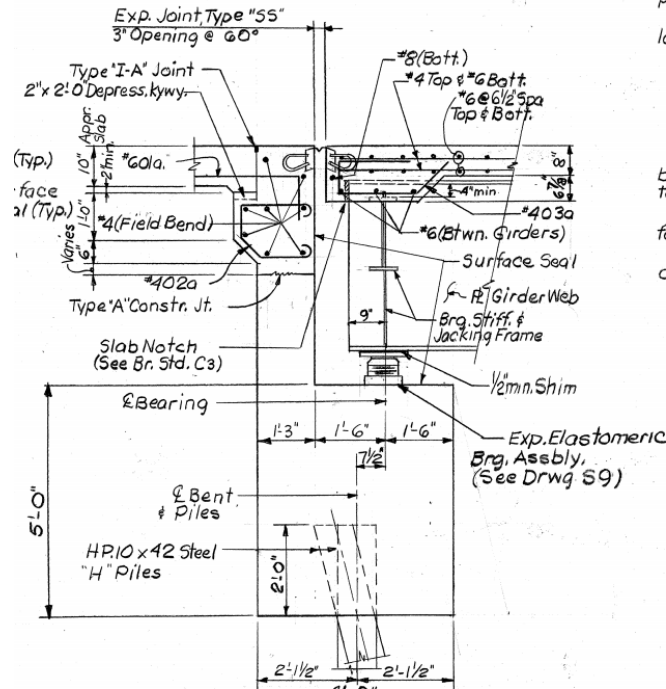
Abutment Detail of the Bridge (NBI 22240) (1989)
